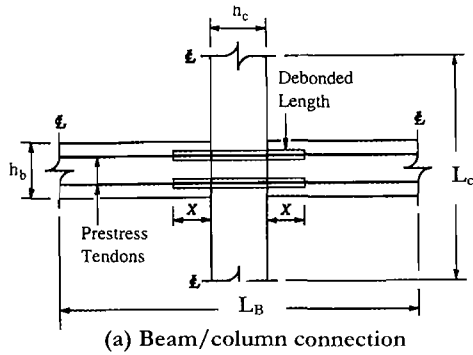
Beam-to-Column Connection with Debonded Tendons
